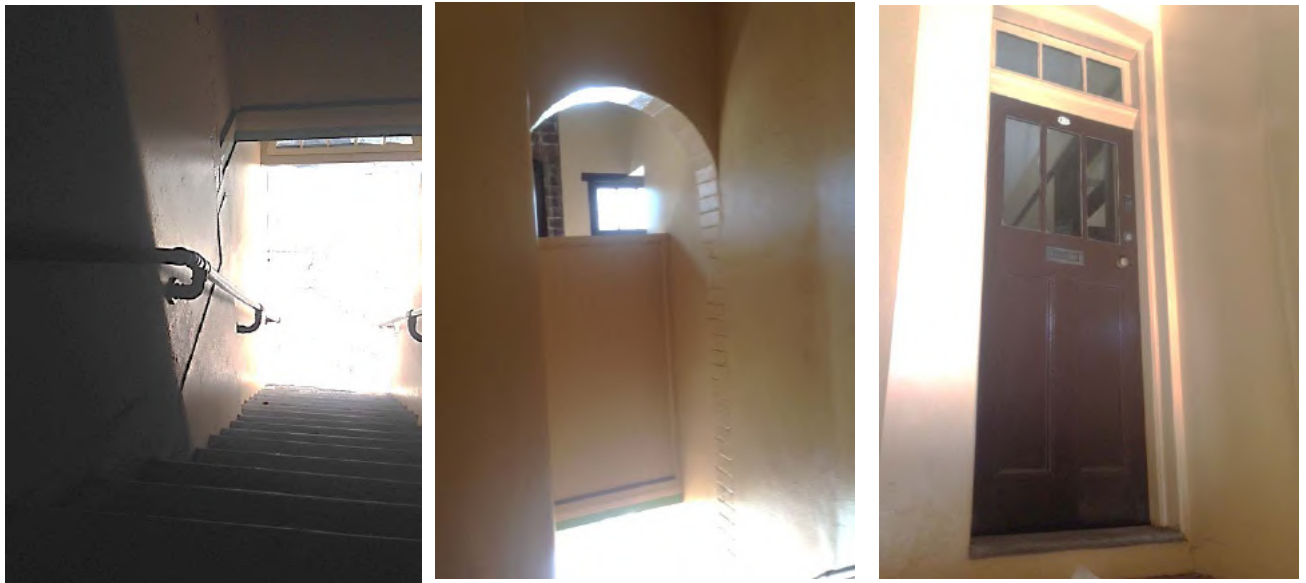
External entry steps, landing (S3) and external entry door to 117A Gloucester Street, 2016.
